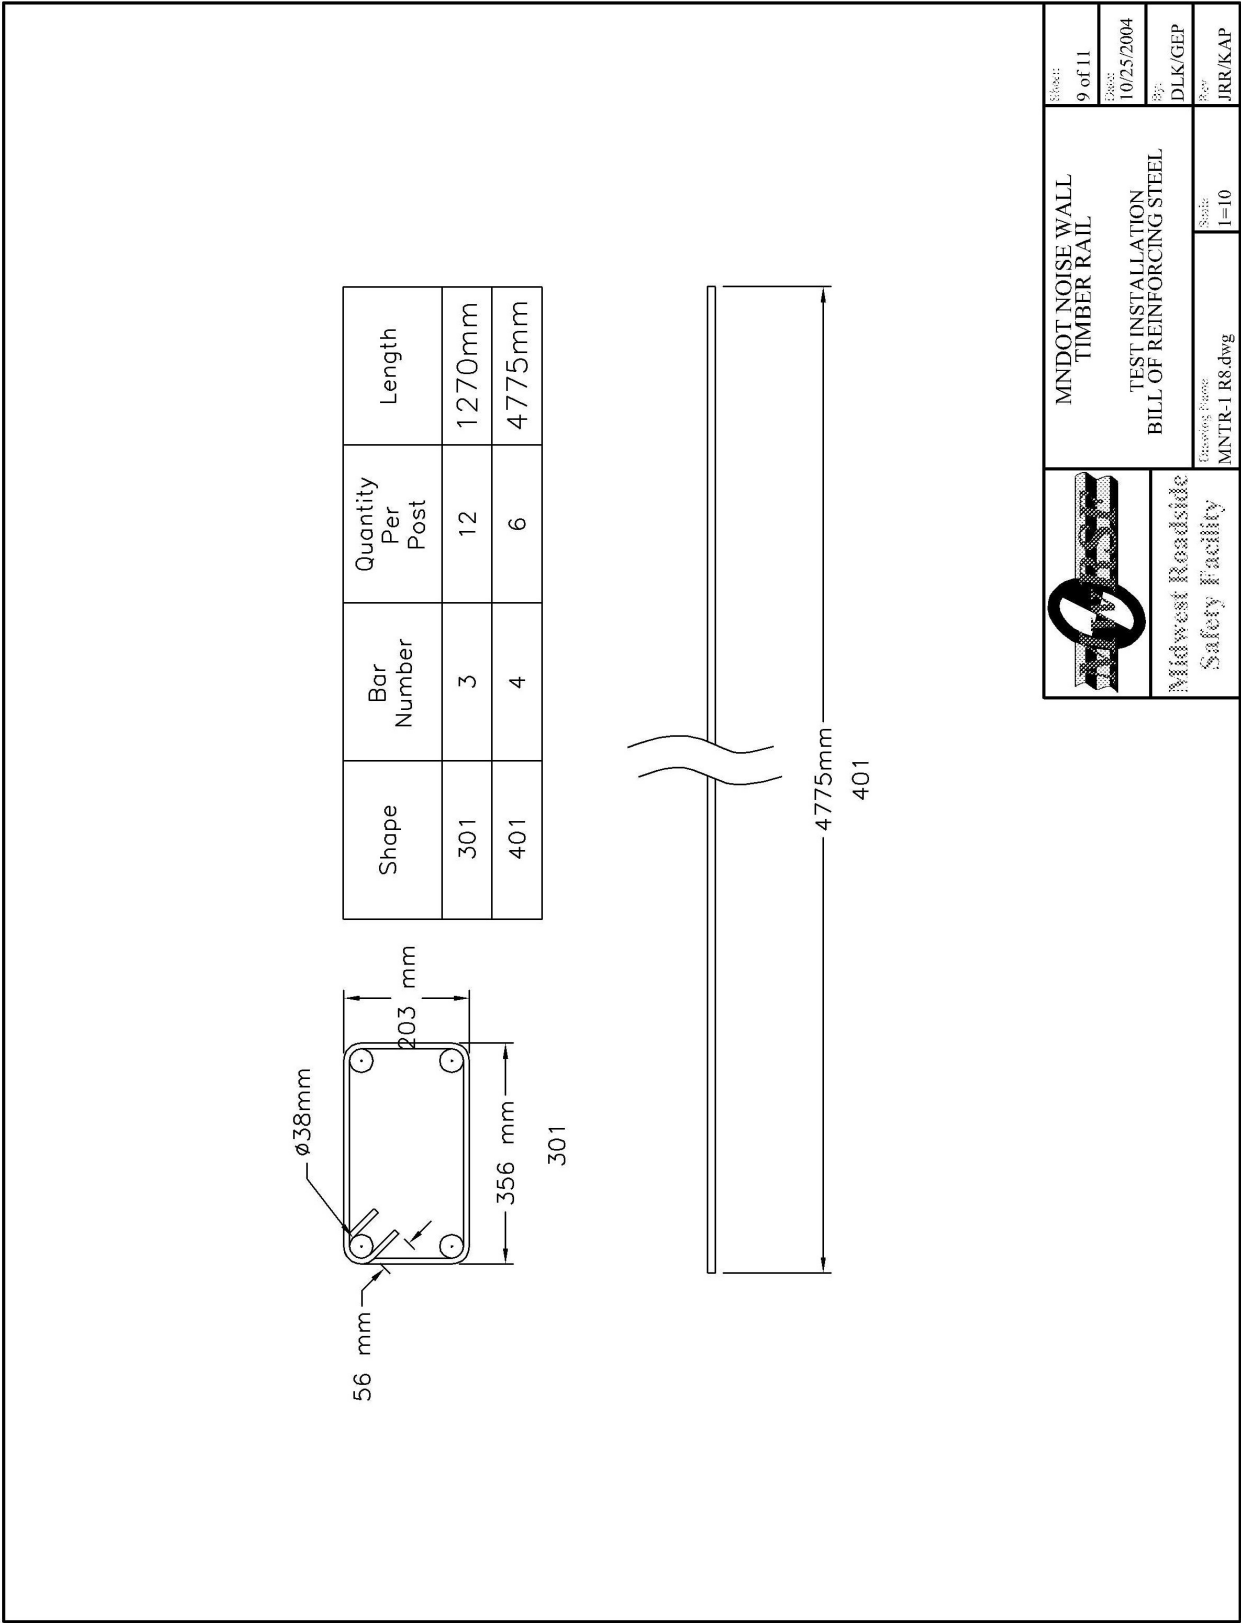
Mn/DOT's Timber Rub Rail Design Reinforcement Details
